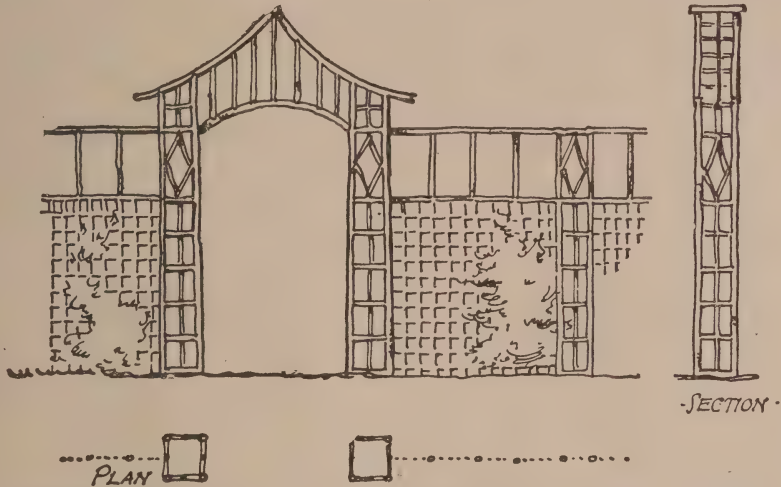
Front Elevation, Section and Plan of Rustic Screen and Arch
